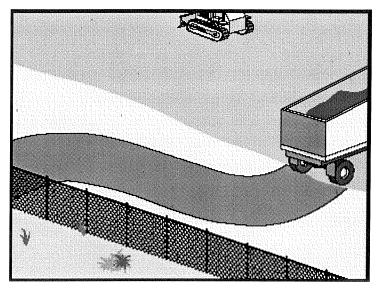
Stabilized Construction Roadway Figure Source: Caltrans, 2003d
